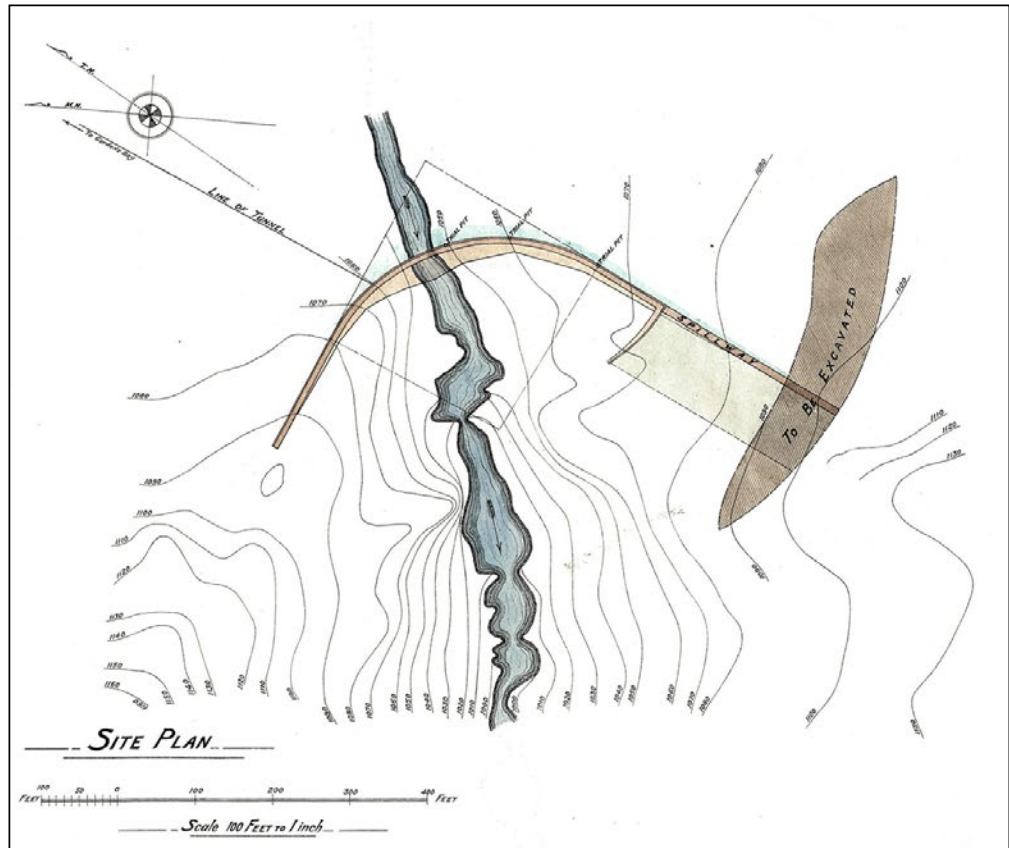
Layout plan of Steenbras I, dated 22 March 1908 (City of Cape Town)
